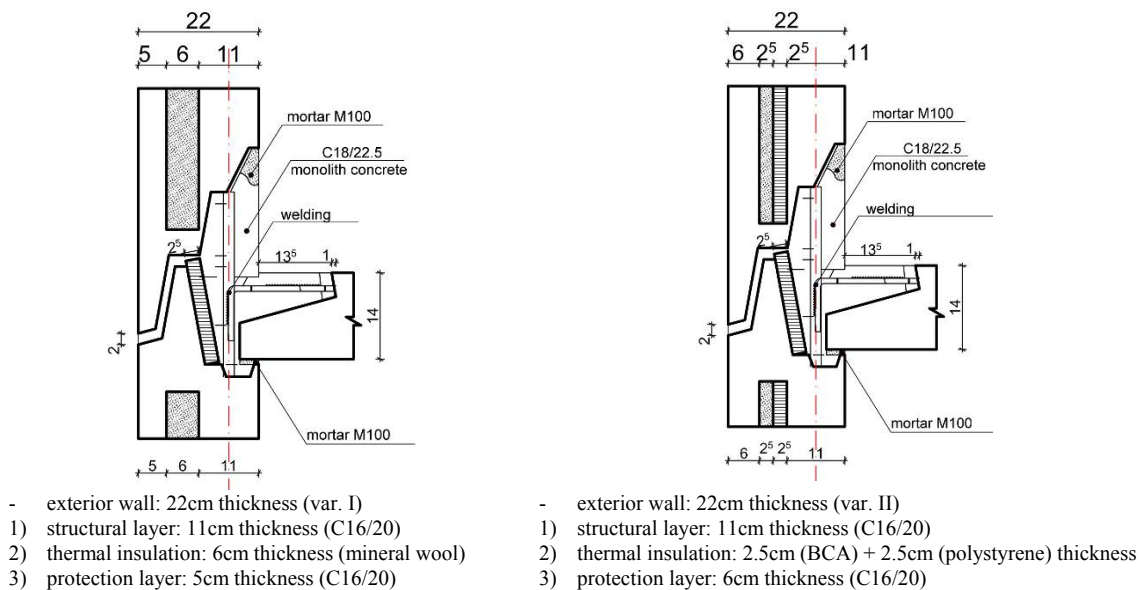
Exterior wall panels for T744R-IPCT project – details for connections and insulation.
